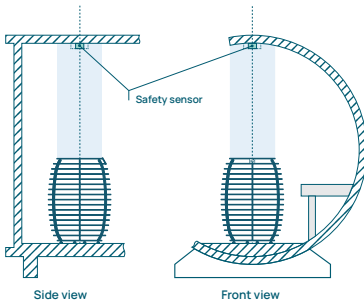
Installing the safety sensor on the ceiling in barrel saunas: floor-mounted heater
